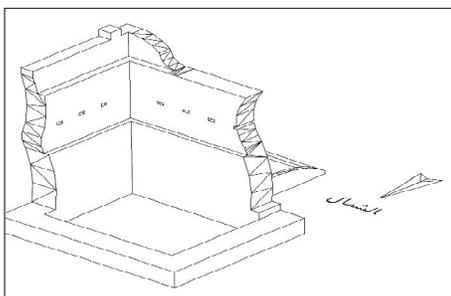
S. & W. walls of the ground and 1<sup>st</sup> floors
